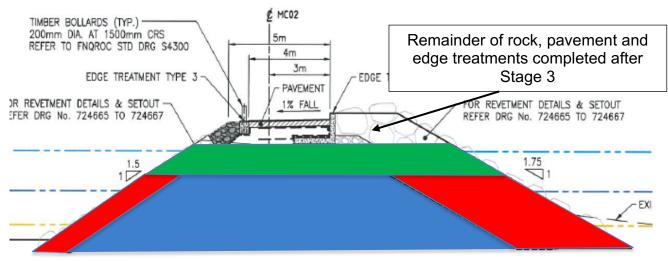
Stage 3 Existing Breakwater Reconstruction
